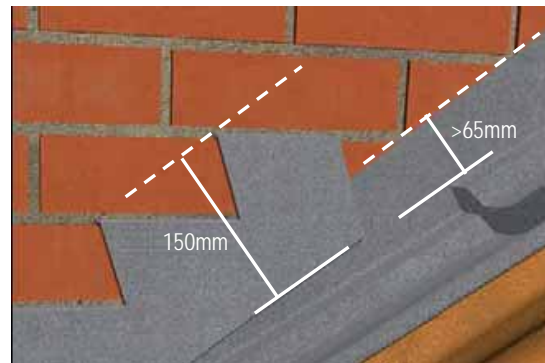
The stepped flashing should be sealed to the cover flashing with a continuous bead of Ubiflex High-Tack sealant.
